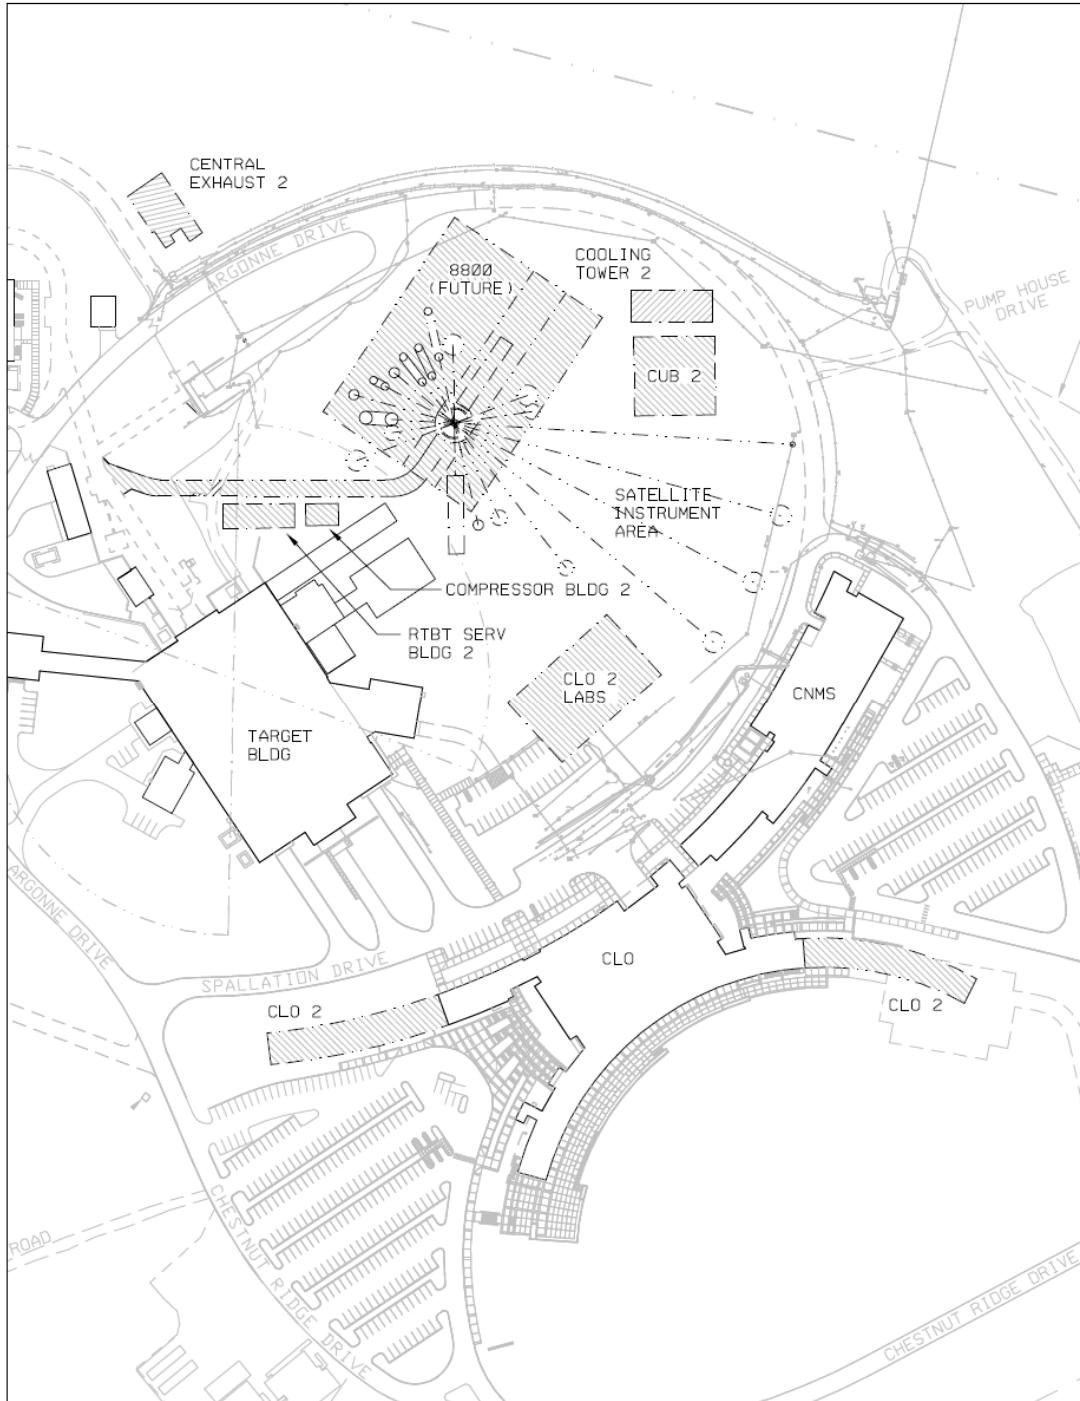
Reference concept layout of the STS. New conventional construction (hatched lines) includes the STS Target Building, Central Lab and Office additions, additional Central Utilities Building, proton beam transport tunnel, and other new utilities and infrastructure. The reference layout of the STS instruments is also shown.
